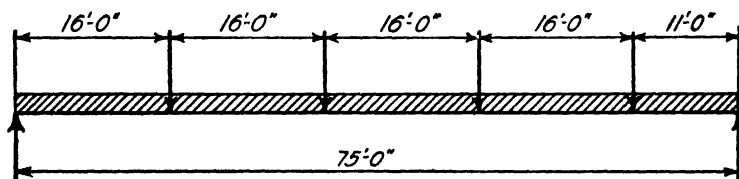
Layout of a 75-foot Girder with Varying Panel Lengths.
